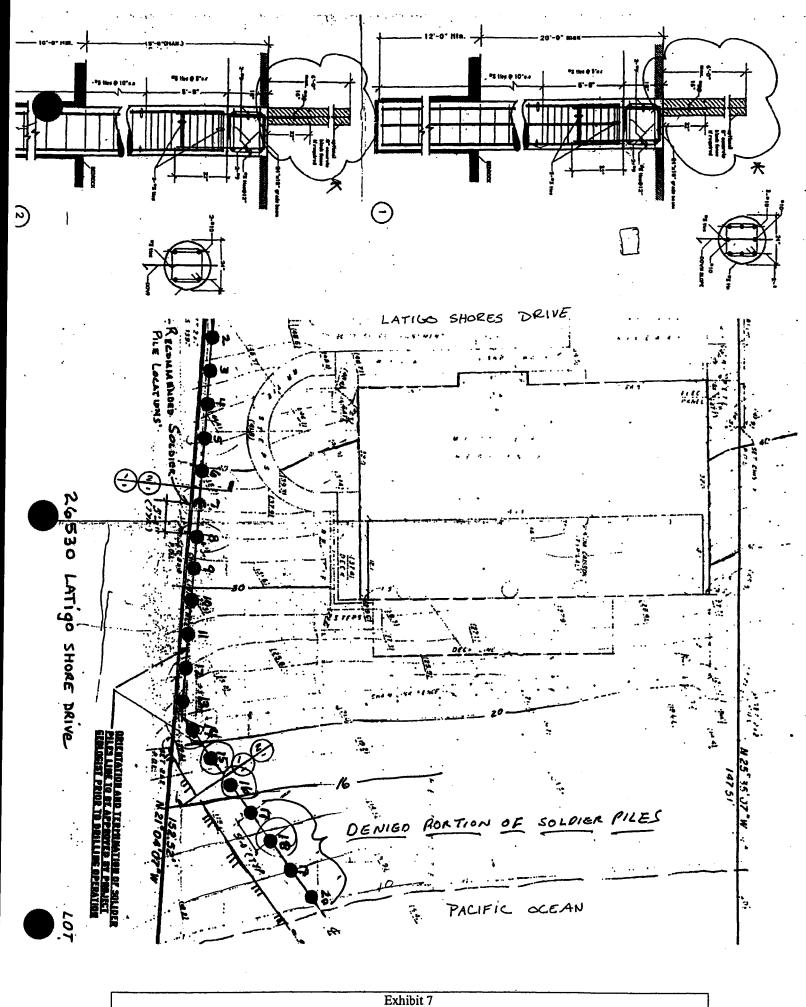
CDP 5-88-794-A2 (Kelly) Elevations- Caissons
